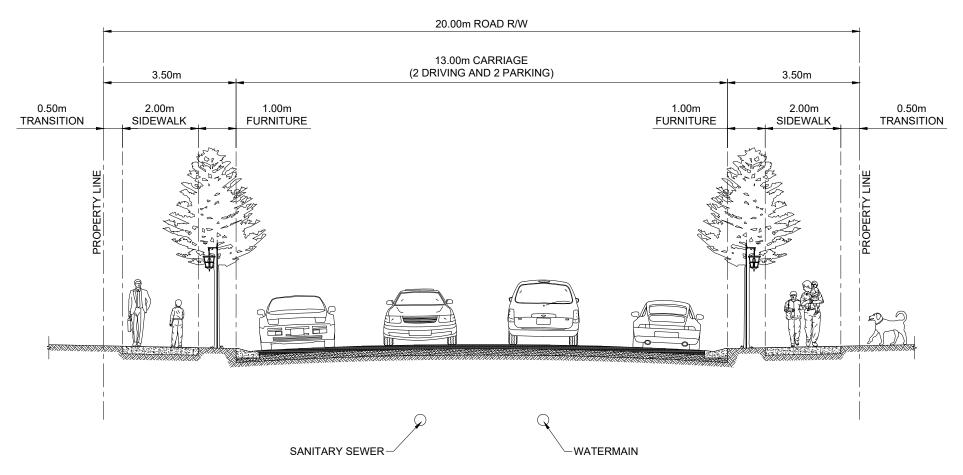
TOWN CENTER STREET TYPICAL SECTION
